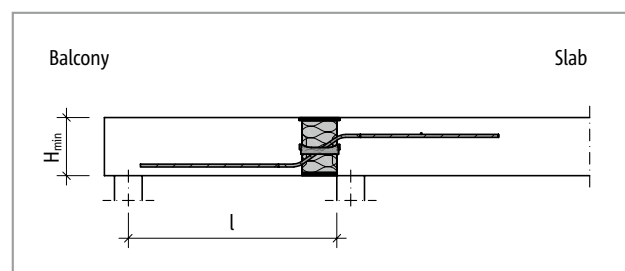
Schöck Isokorb® XT type Q: Static system (XT type Q-V5 to V11)
